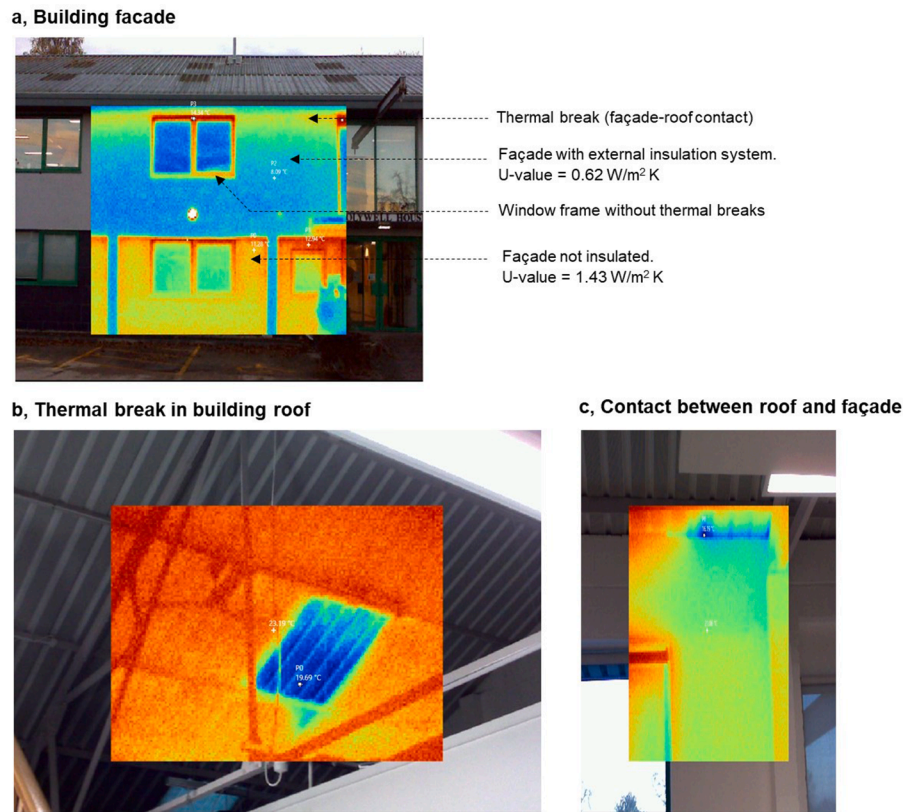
Infrared images identifying building thermal bridges in main building façade (a), building roof (b), and roof-wall contact (c).
